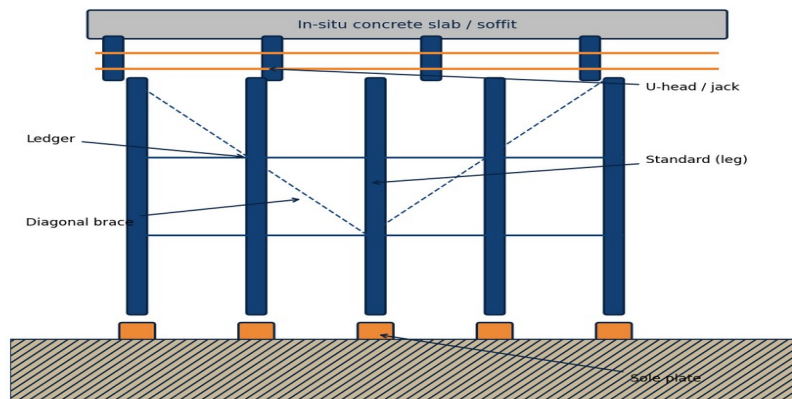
Typical falsework arrangement for an in-situ concrete soffit.
